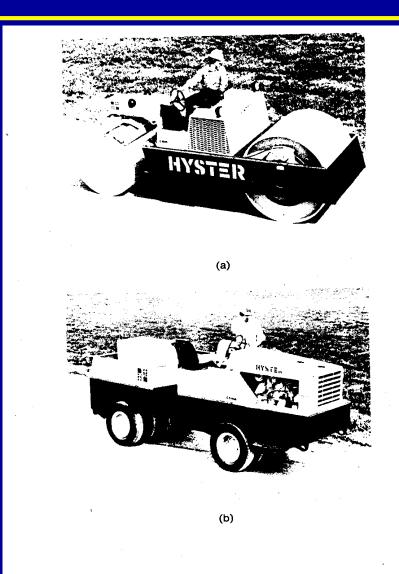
Types of rollers: (a) smooth-wheel roller; (b) rubber-tired roller (self-propelled) (photographs courtesy of Hyster Company, Construction Equipment Division).
